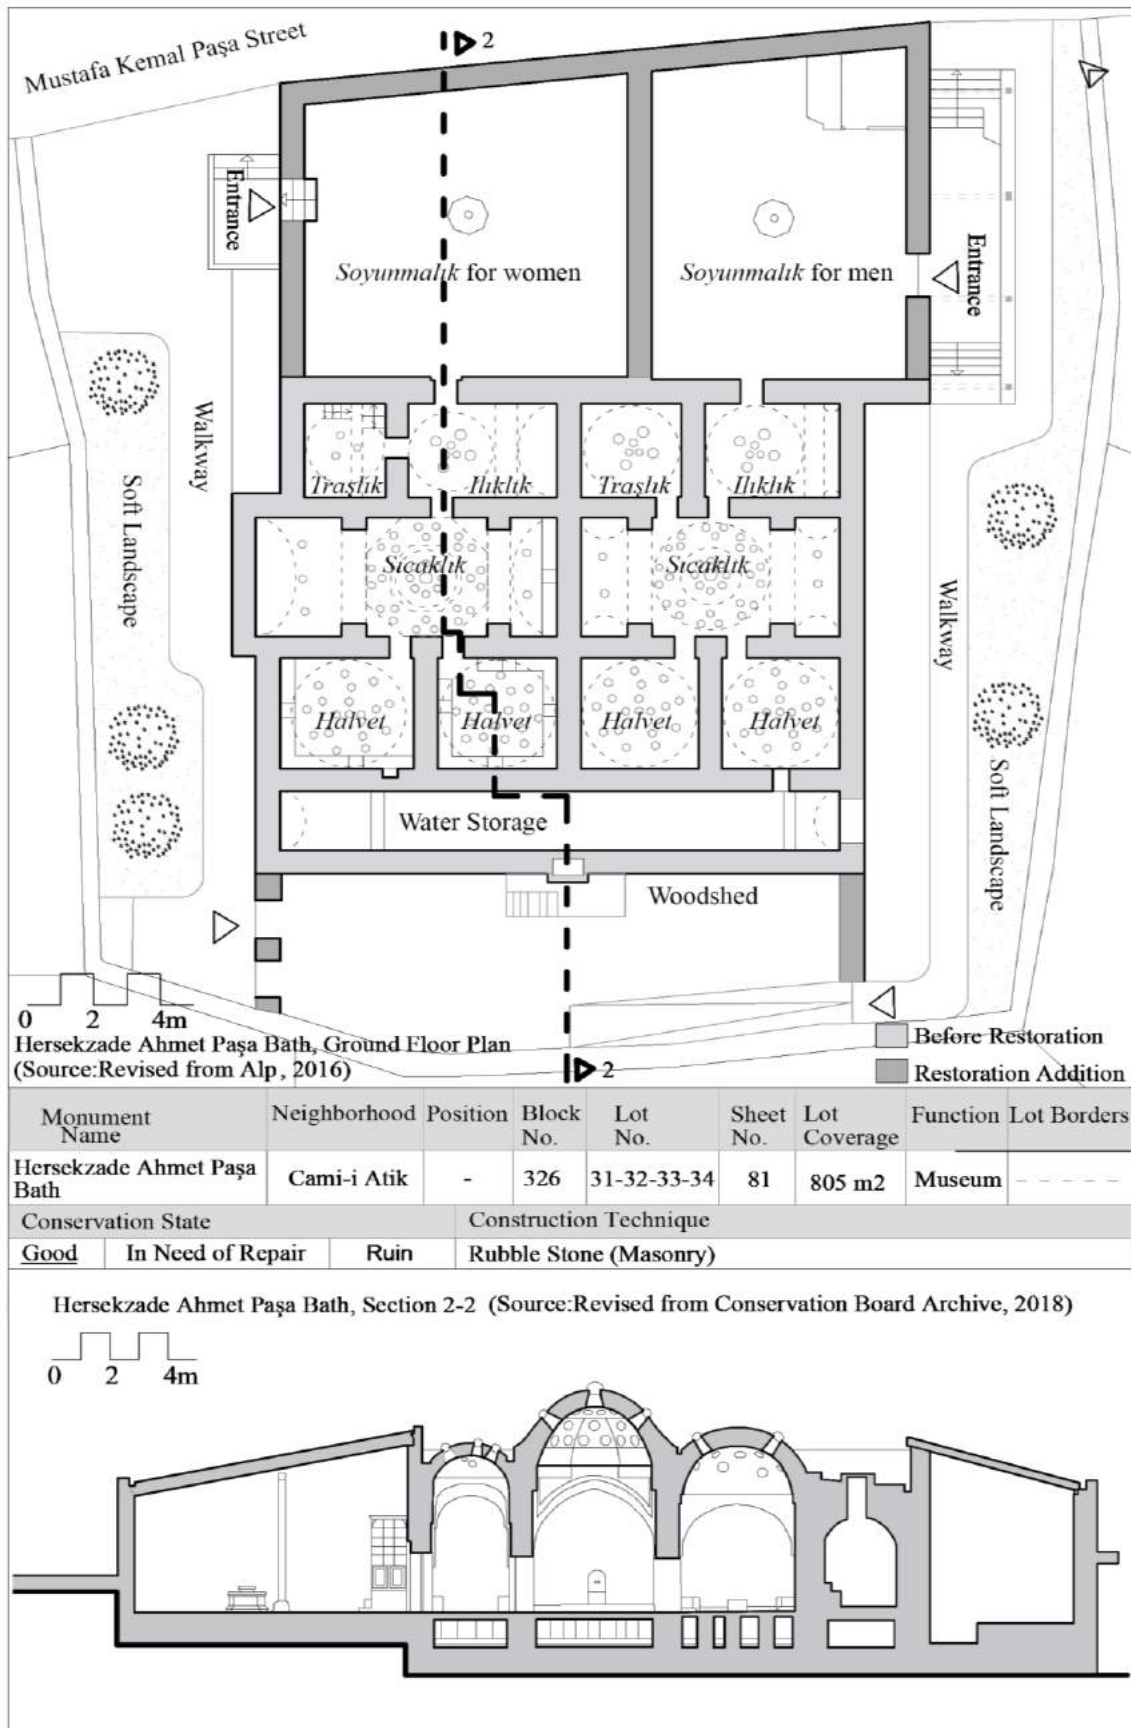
Ground floor plan and section, Hersekzade Ahmet Paşa Bath
